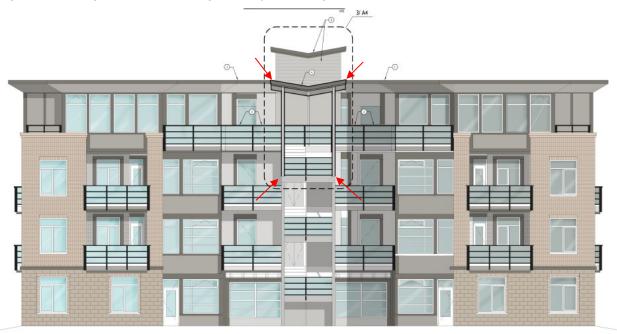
Proposed roof over stairway for 5692 Kings Road, Area D (red arrows not on plans).
